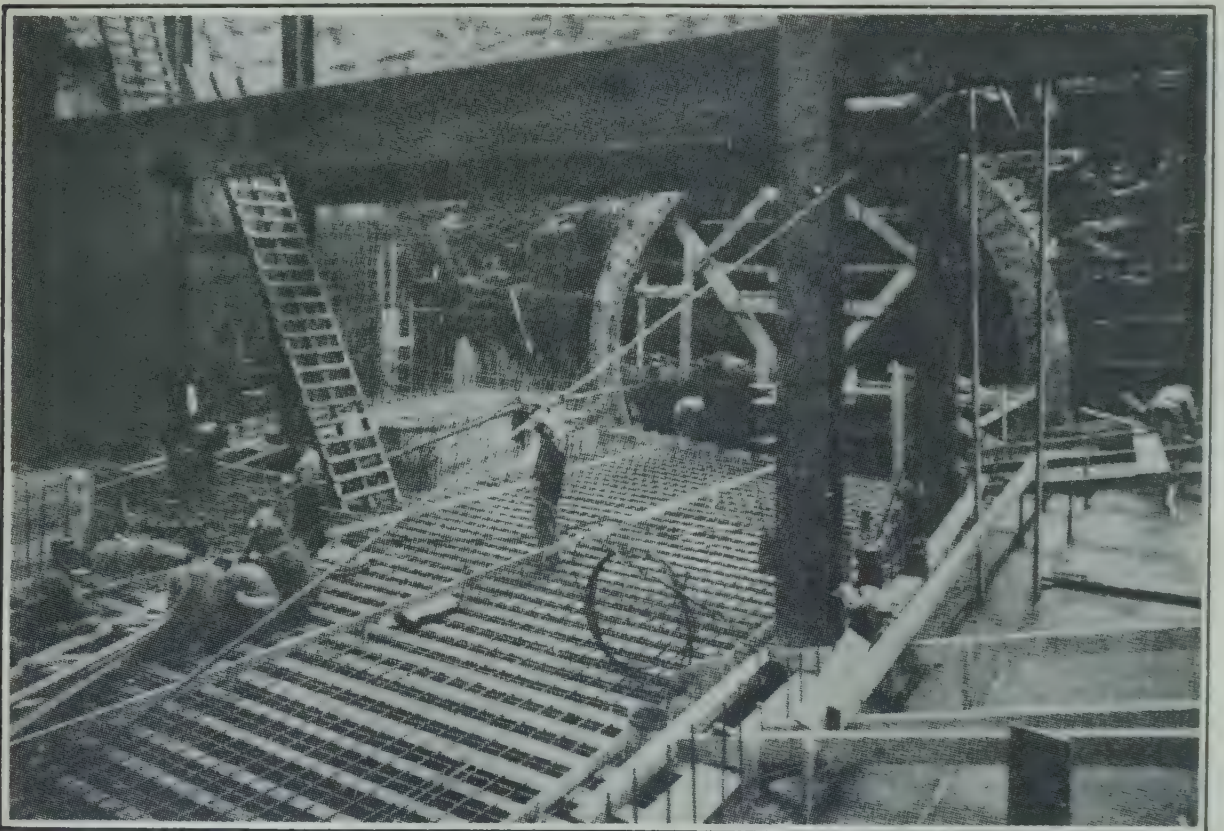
Construction of the roadway slab of the Lincoln Tunnel at the New Jersey shaft.
